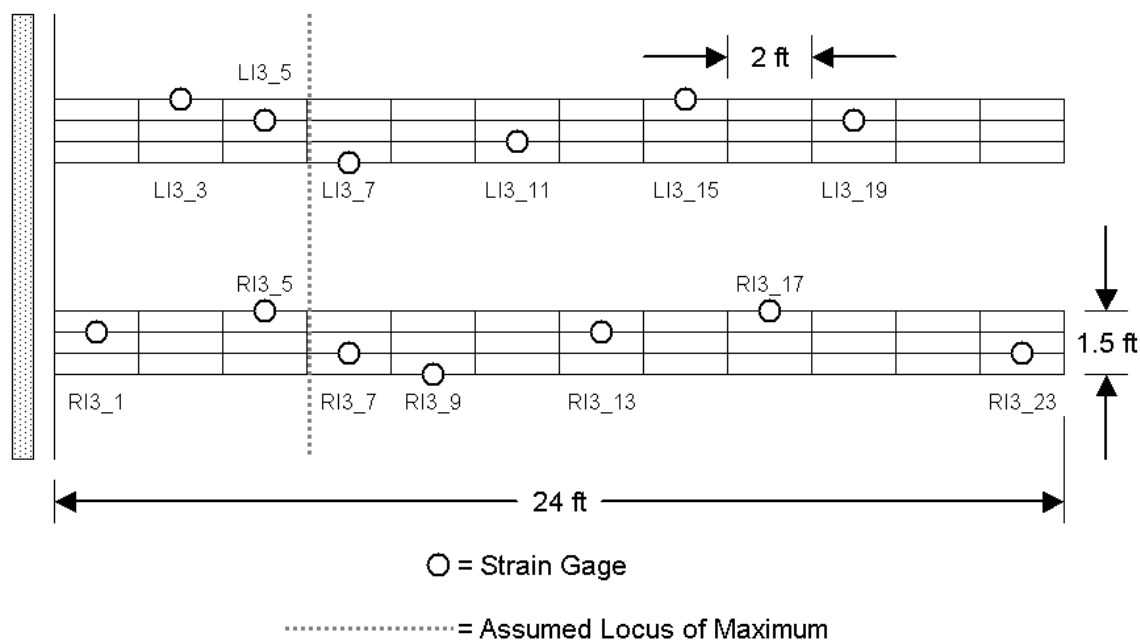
Plan view of instrumented primary bar mat IL3 at level 3 located in the intermediate and primary reinforced section.
